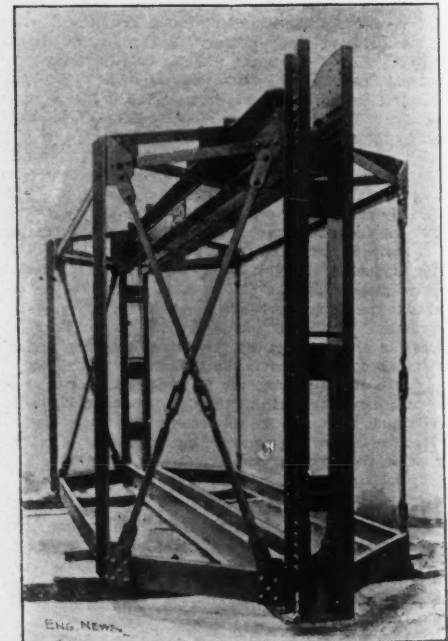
View Showing the Framing of the Lozenge-Shaped Side Cars for the Three-Car Shafts.
